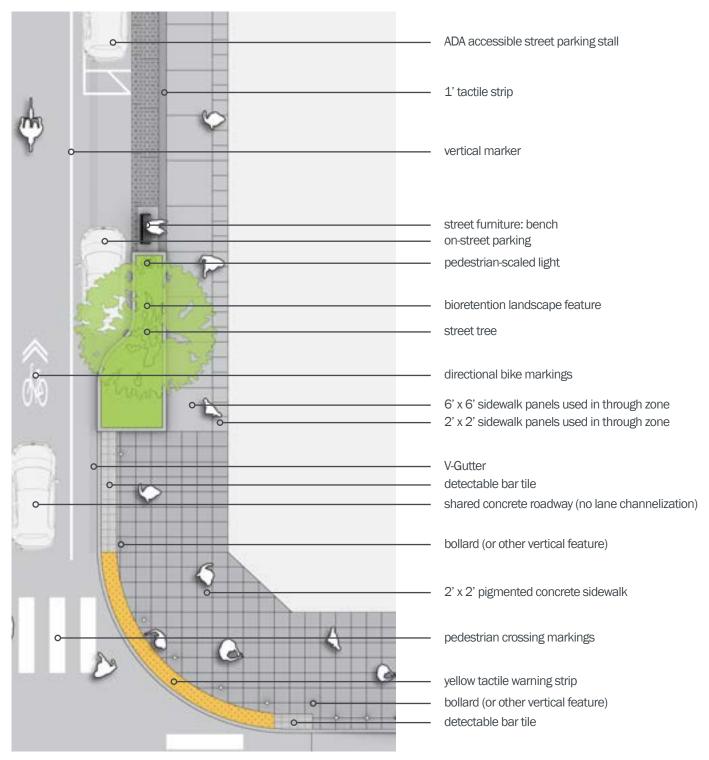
Green Street Sidewalk Standards. Note: Required on-street parking alternates with expanded landscape areas.
